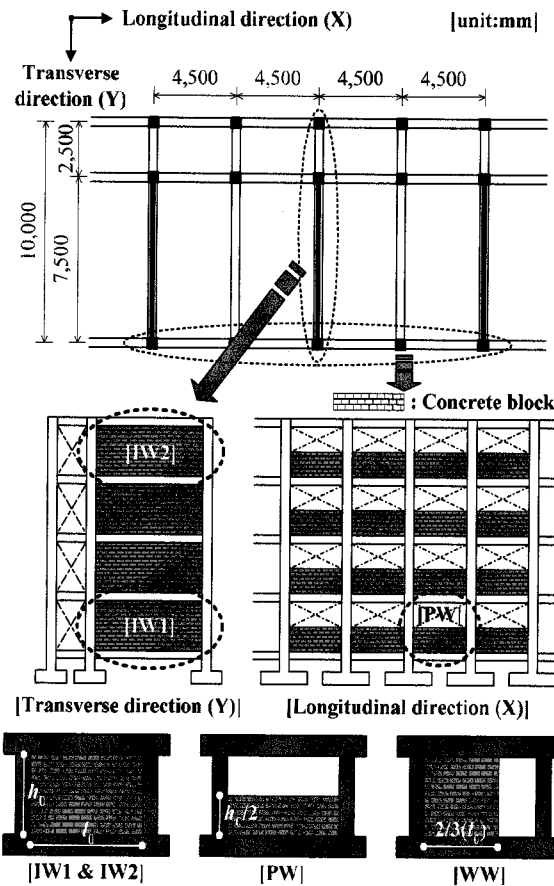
Standard design of Korean school buildings in the 1980s and specimen configuration
